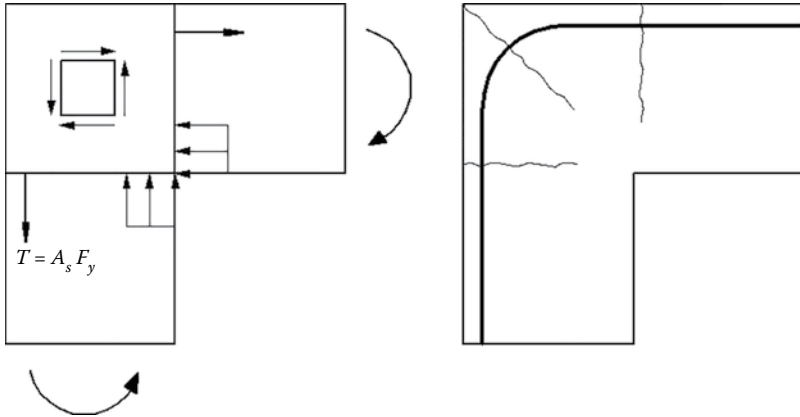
Stresses and cracking in a closing corner joint.
